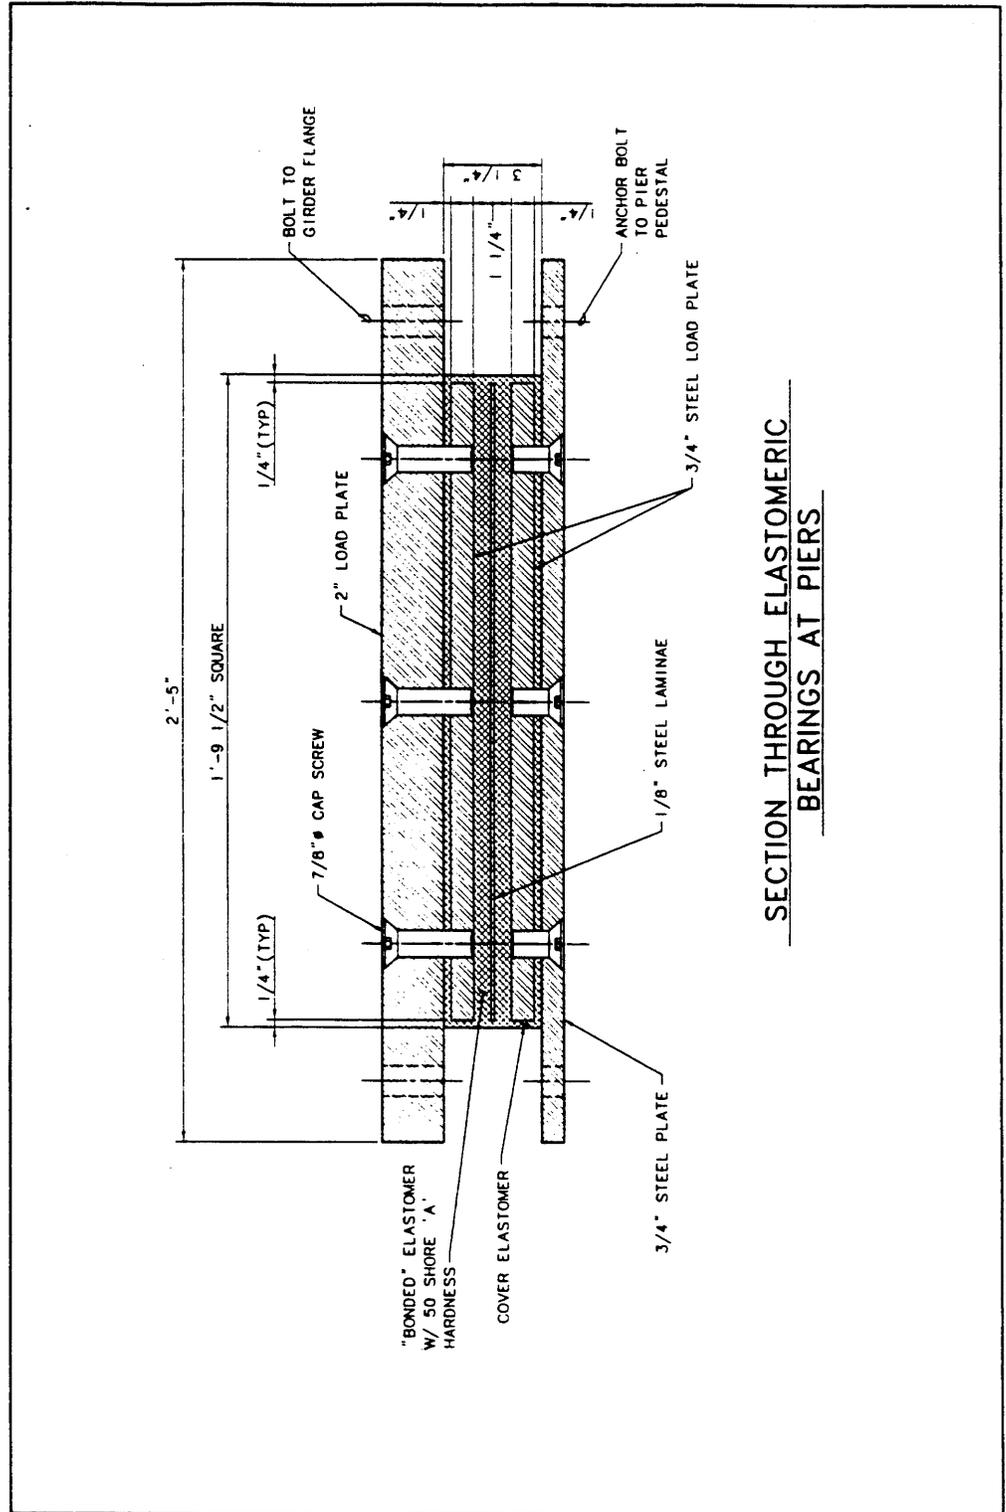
Bridge No. 2 - Elastomeric Bearings at Piers
